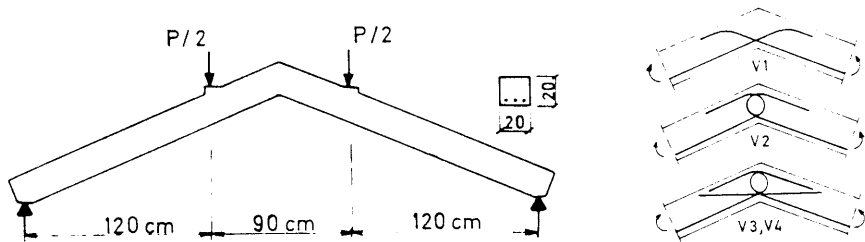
Dimensions and Method of Loading of Test Specimen (1 in. = 25.4 mm)
